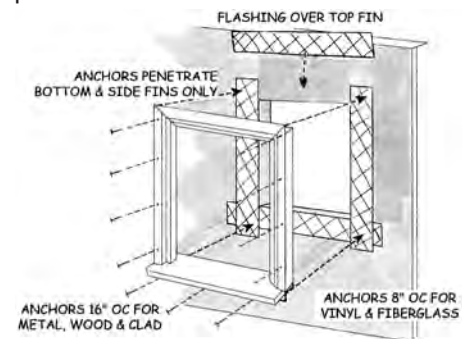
ATTACHMENT AND FLASHING REQUIREMENTS FOR FULL-FRAME REPLACEMENT WINDOWS
